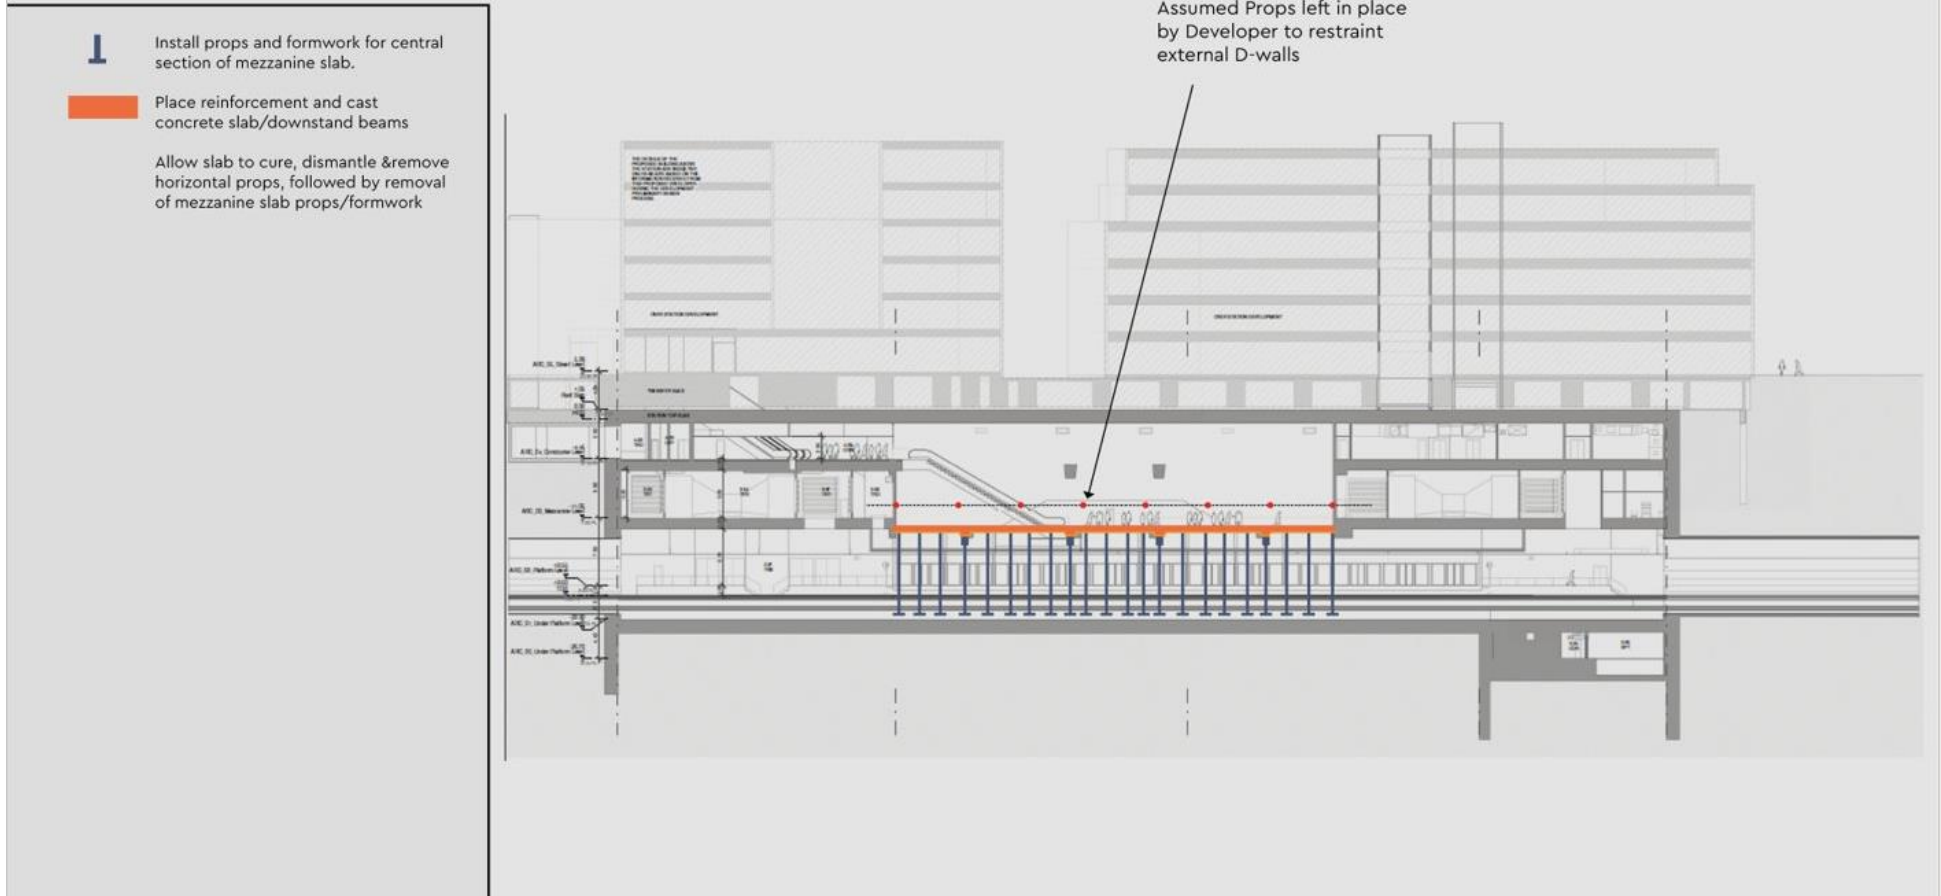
O'Connell Street – Civil works/ MEP fit out Construct mezzanine slab
